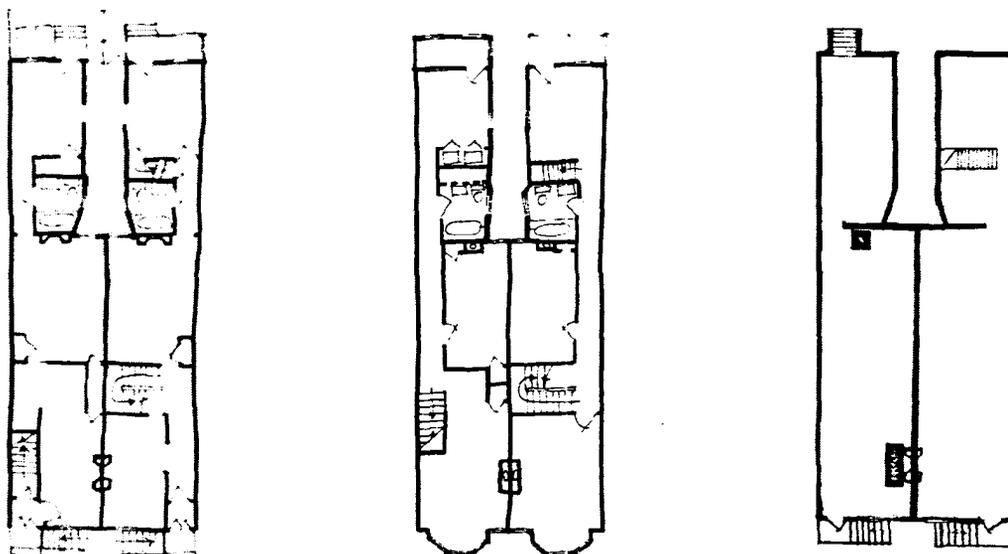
Left to Right: First Floor, Second Floor, and Basement
